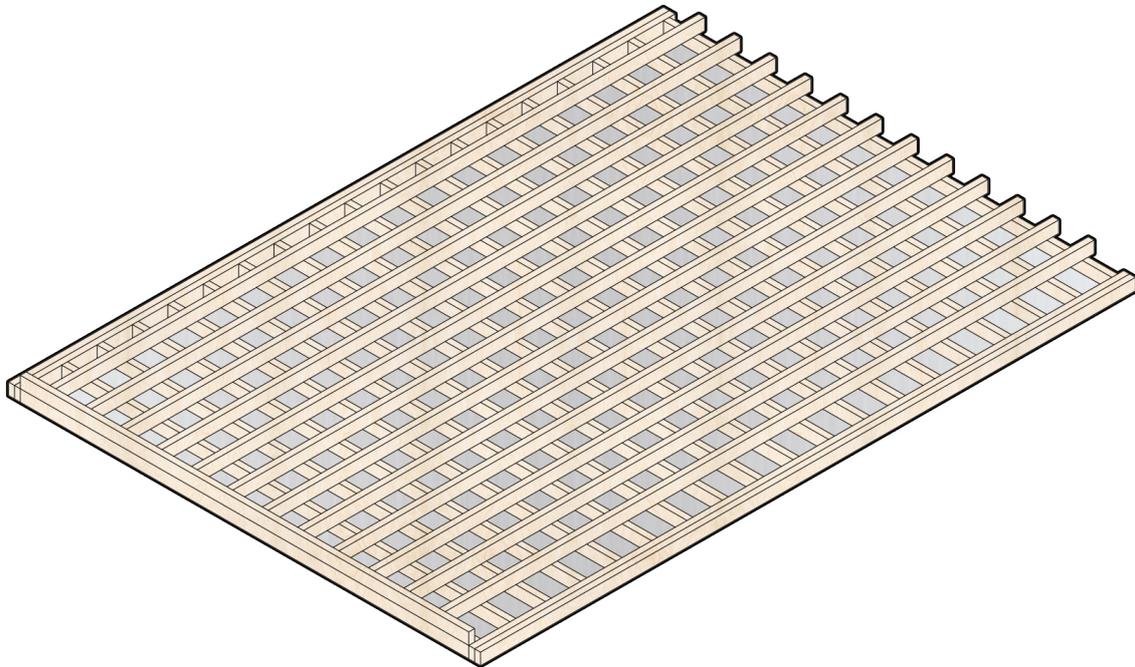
Construction stage 1 placing perforated metal sheet on surface and laid massive of timber on top of metal sheet to form foundation. Original author
